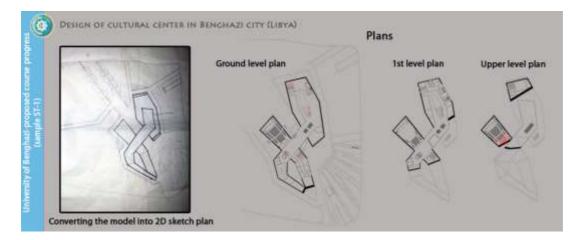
More detailed plans are submitted, work of student ST-1.
